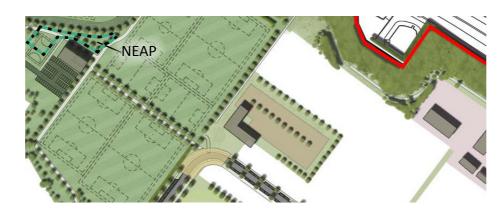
Landscape set-piece: Sheepfold Green (see section 4)
